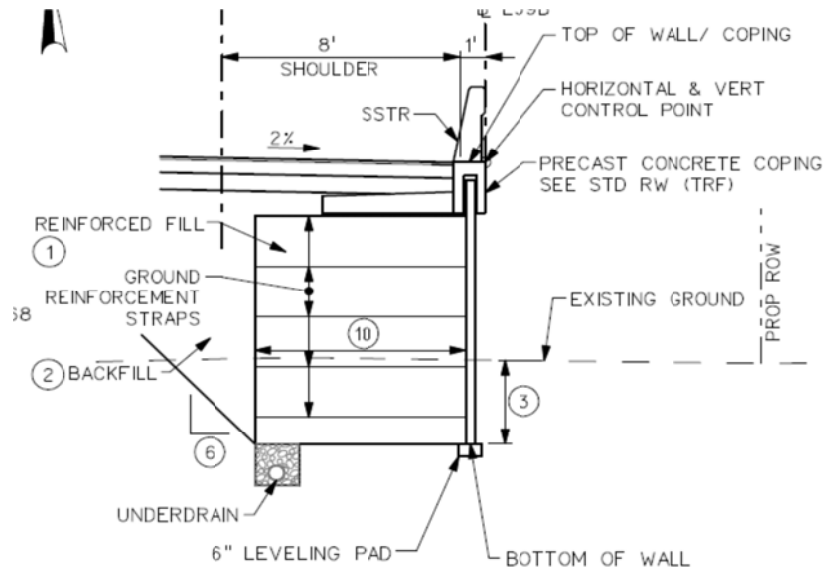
Wall 4 MSE Wall Typical section (personal archive 2012)
